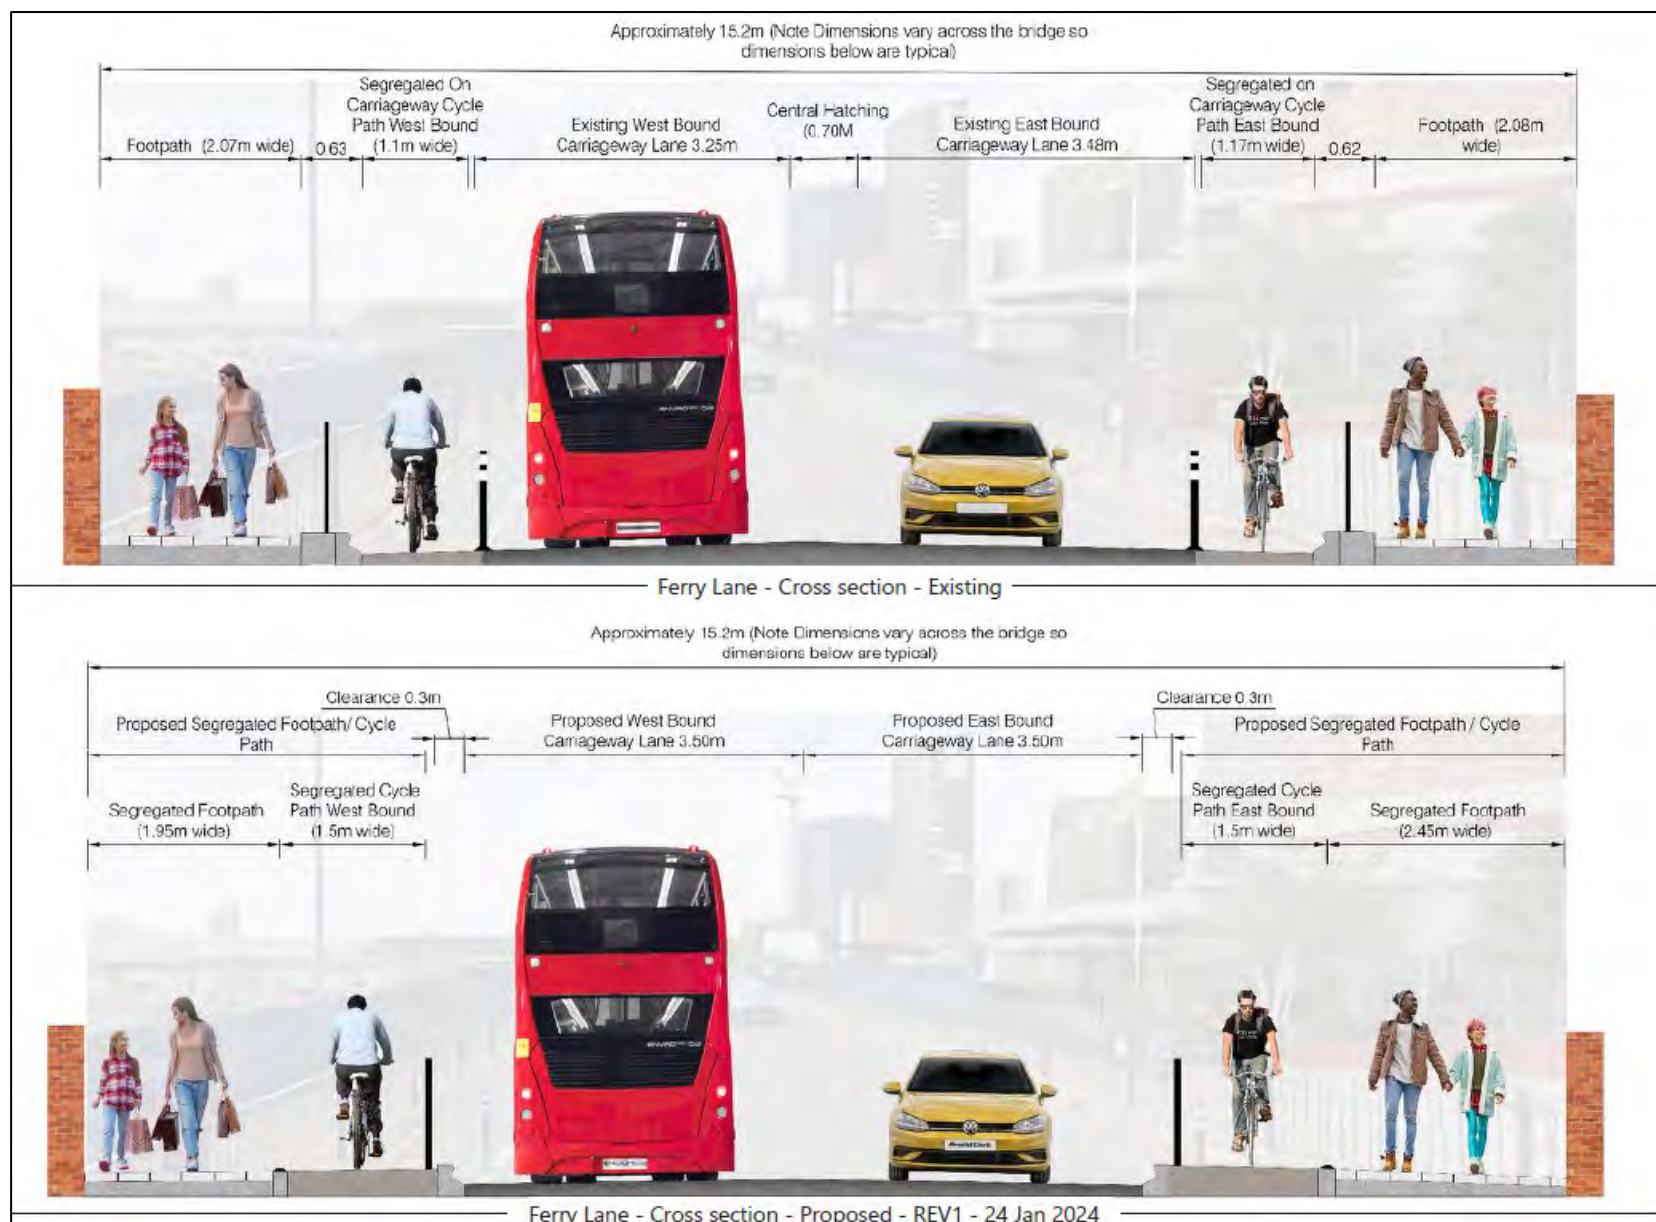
Existing and Proposed Indicative Ferry Lane Cross Section. (Source: Design and Access Statement).
